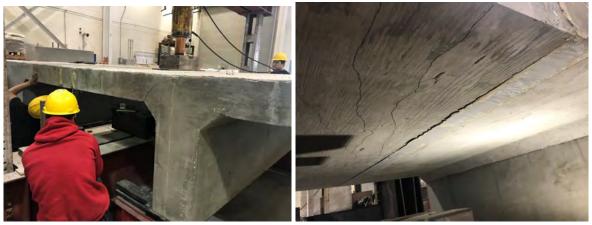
Crack mapping and failure of specimen F-R-SHPC
